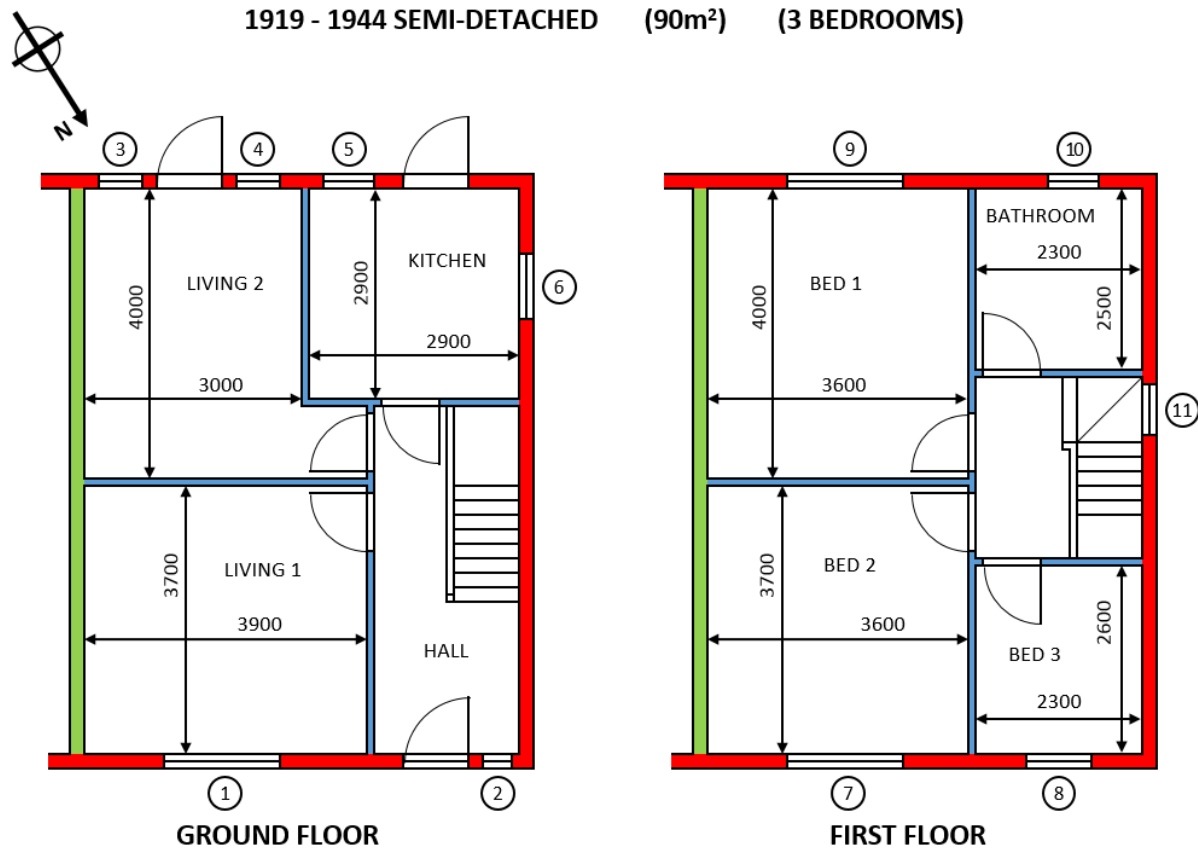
1919-1944 semi-detached – building layout. Window references are numbers in circles; red walls are external, blue walls are internal and green walls are party.
